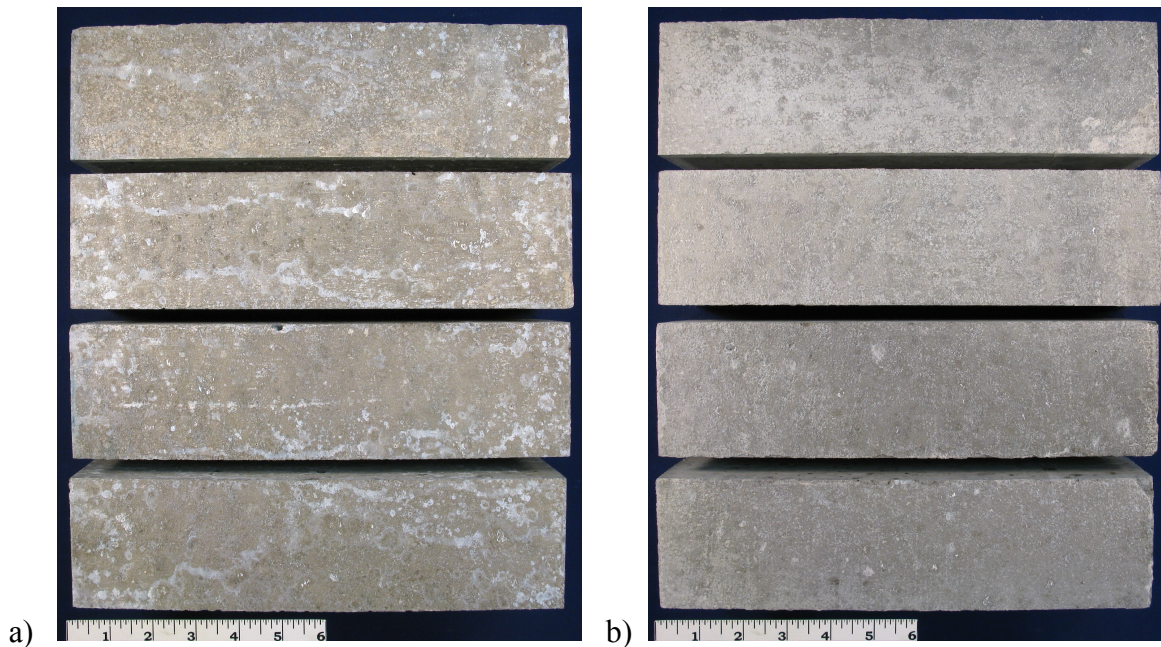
Concrete prism specimens showing struck top surfaces of a) RA and b) NRA specimens
